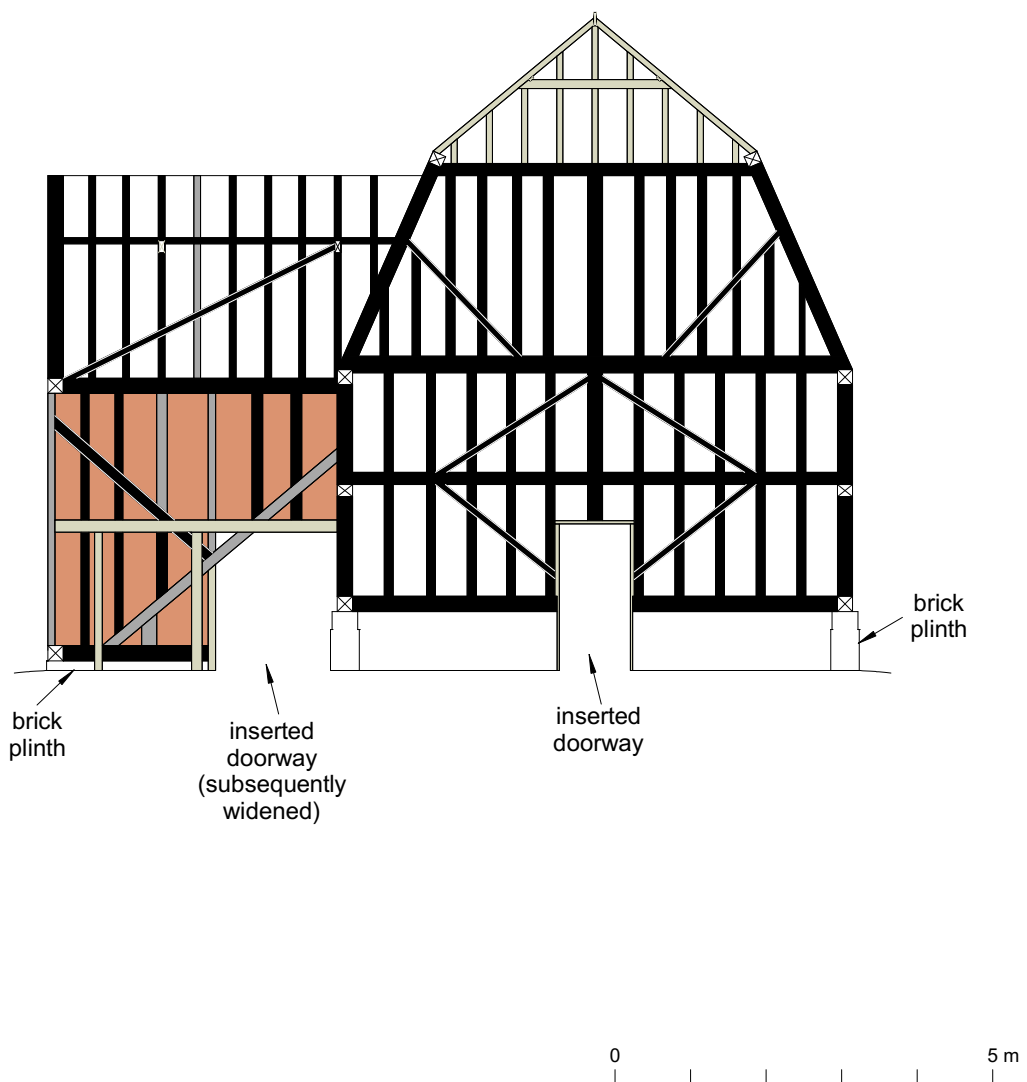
Frame drawing of the south-east wall to the Grain Barn, indicating the locations of original, re-used and replacement timbers.
